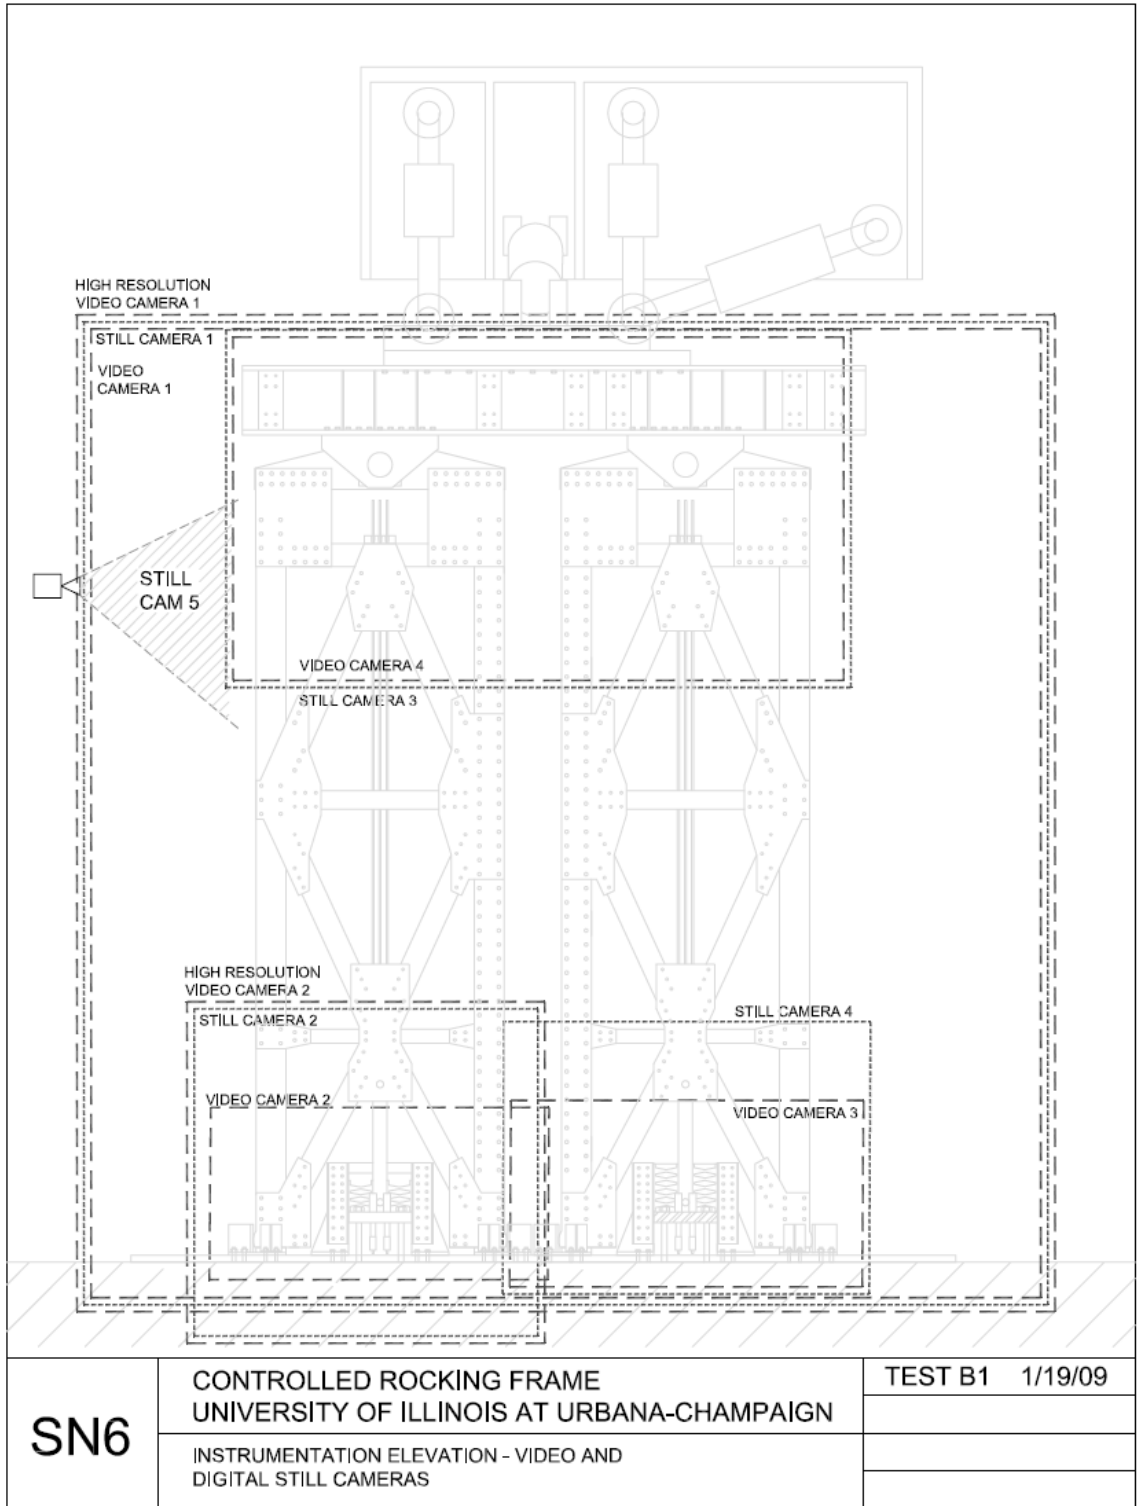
Single Frame Configuration Instrumentation Plan Drawing – Camera Plan
